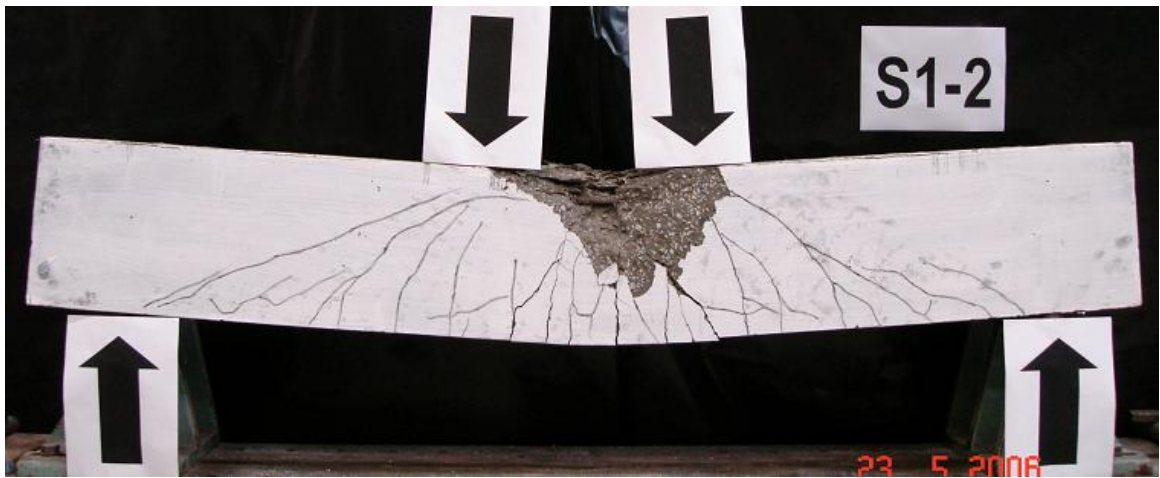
Overall Crack Pattern for Beam S1-2 (Back Face)
